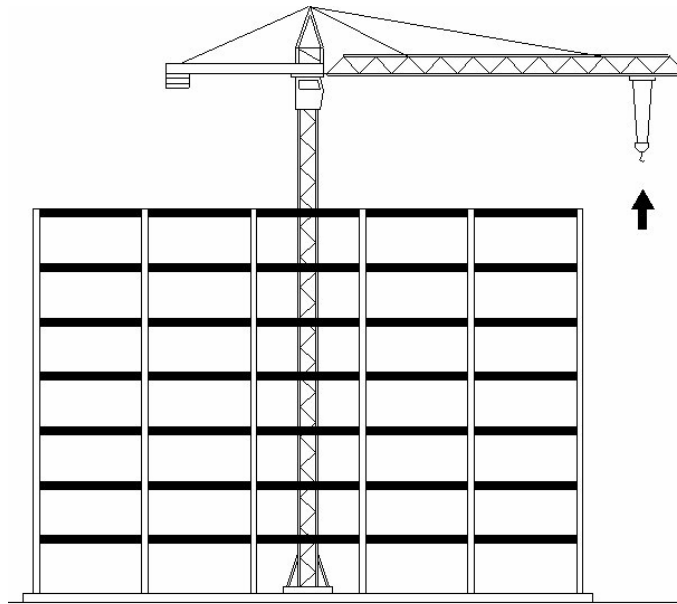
A steel multi-frame building constructed with fixed tower crane. [29]
